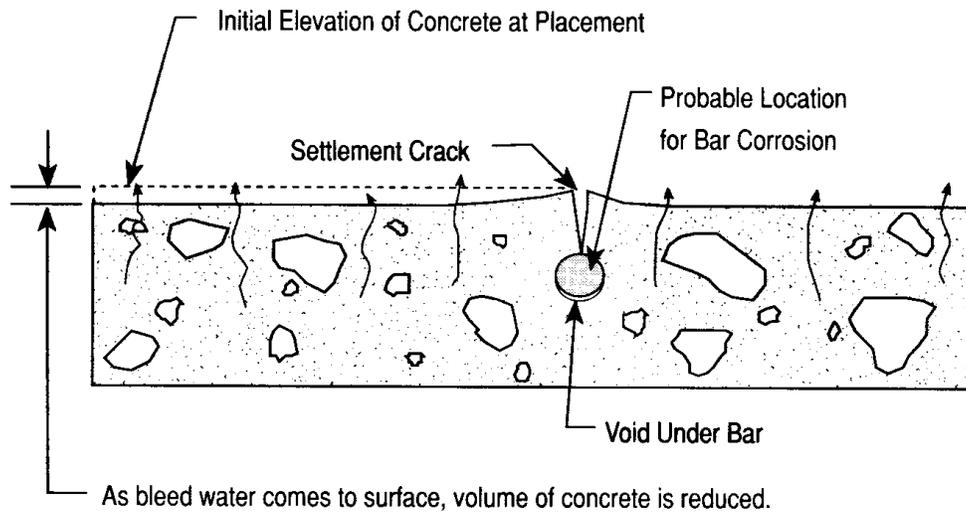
Subsidence Cracking of Concrete over Steel Reinforcement. (Emmons, 1993)
